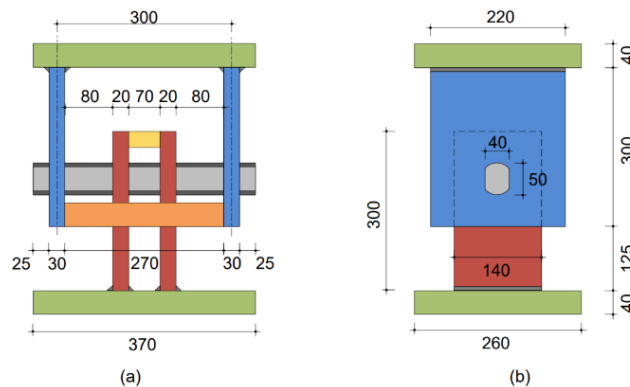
DRD1 first campaign geometry: (a) top view and (b) side view, dimensions in mm.
